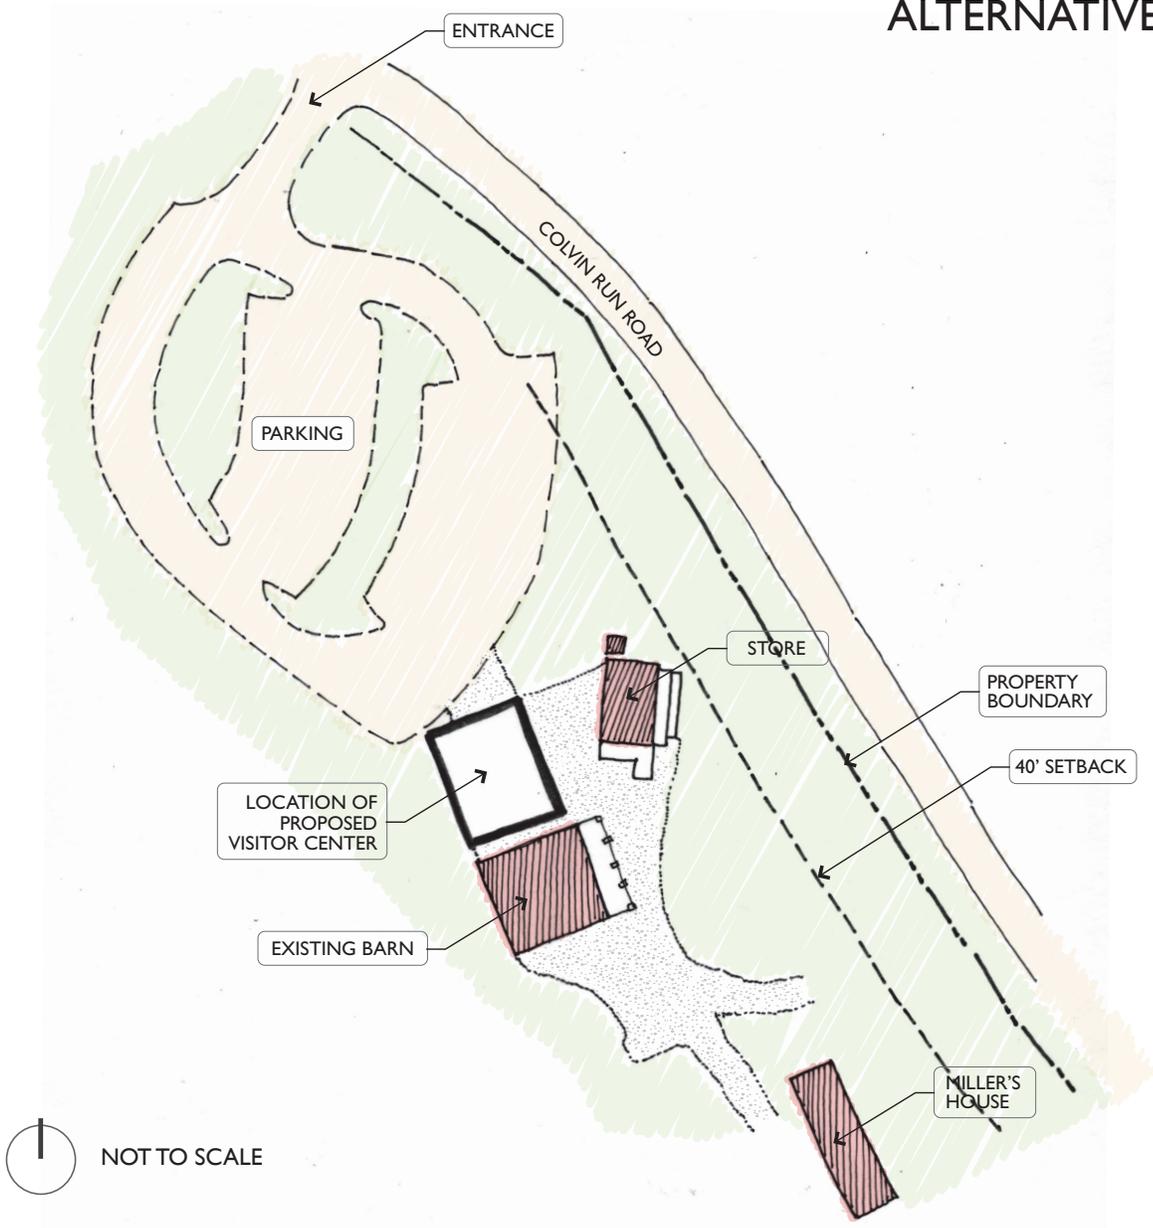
Alternative A, in which the existing barn is retained and proposed visitor center is placed on its north side. JMA, 2010.
